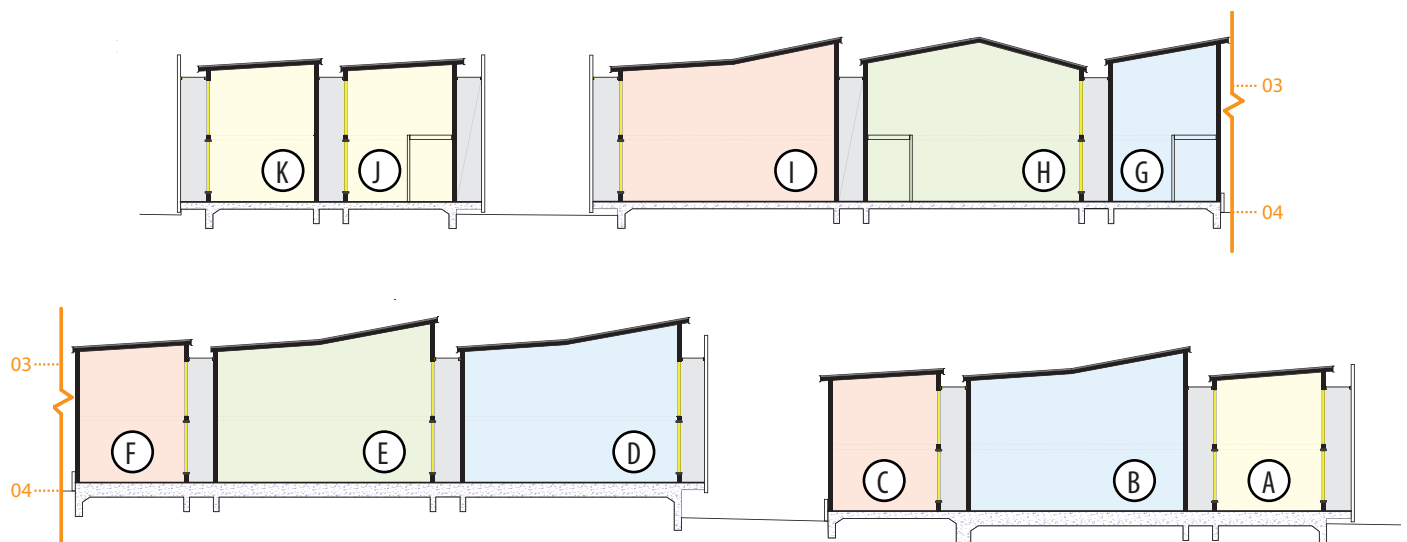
// Sections through the grouped dwellings show the cavities that divide them.
